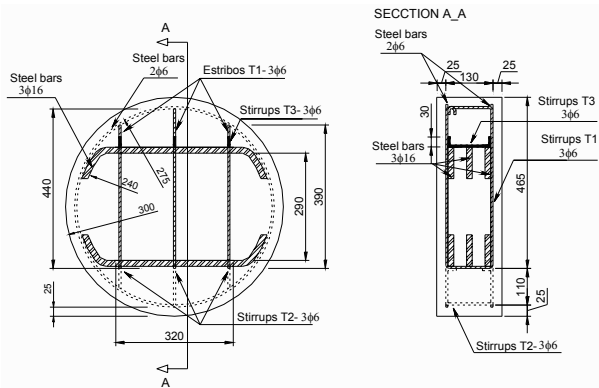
Arrangement of the conventional reinforcement (dimensions in mm)
